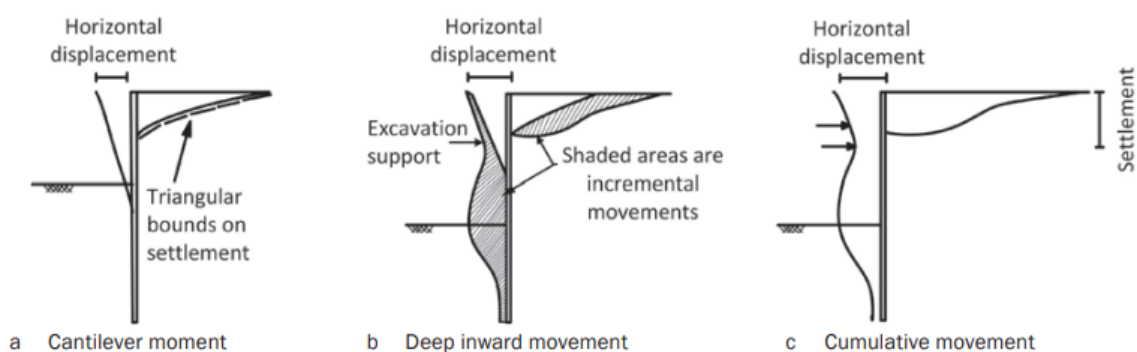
Typical ground settlement deformation as a result of retaining wall deflection and with time. (a) occurs with initial retaining wall construction can cause a spandrel type cantilever movement. As excavation continues with depth, excavation support is provided creating (b) deep inward movement occurs with incremental total settlement in a concave type ground settlement. Following the combination of (a) and (b) the cumulative movement and ground settlement shape is exhibited (c) and may vary depending on whether spandrel or concave type settlement was more dominant (CIRIA C760).
